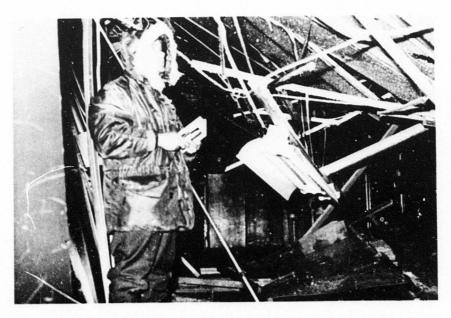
Crushing of wood and steel reactor building in Trench 3.
